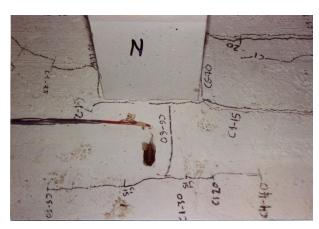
Transverse cracking in floor slab at ultimate moment from North
